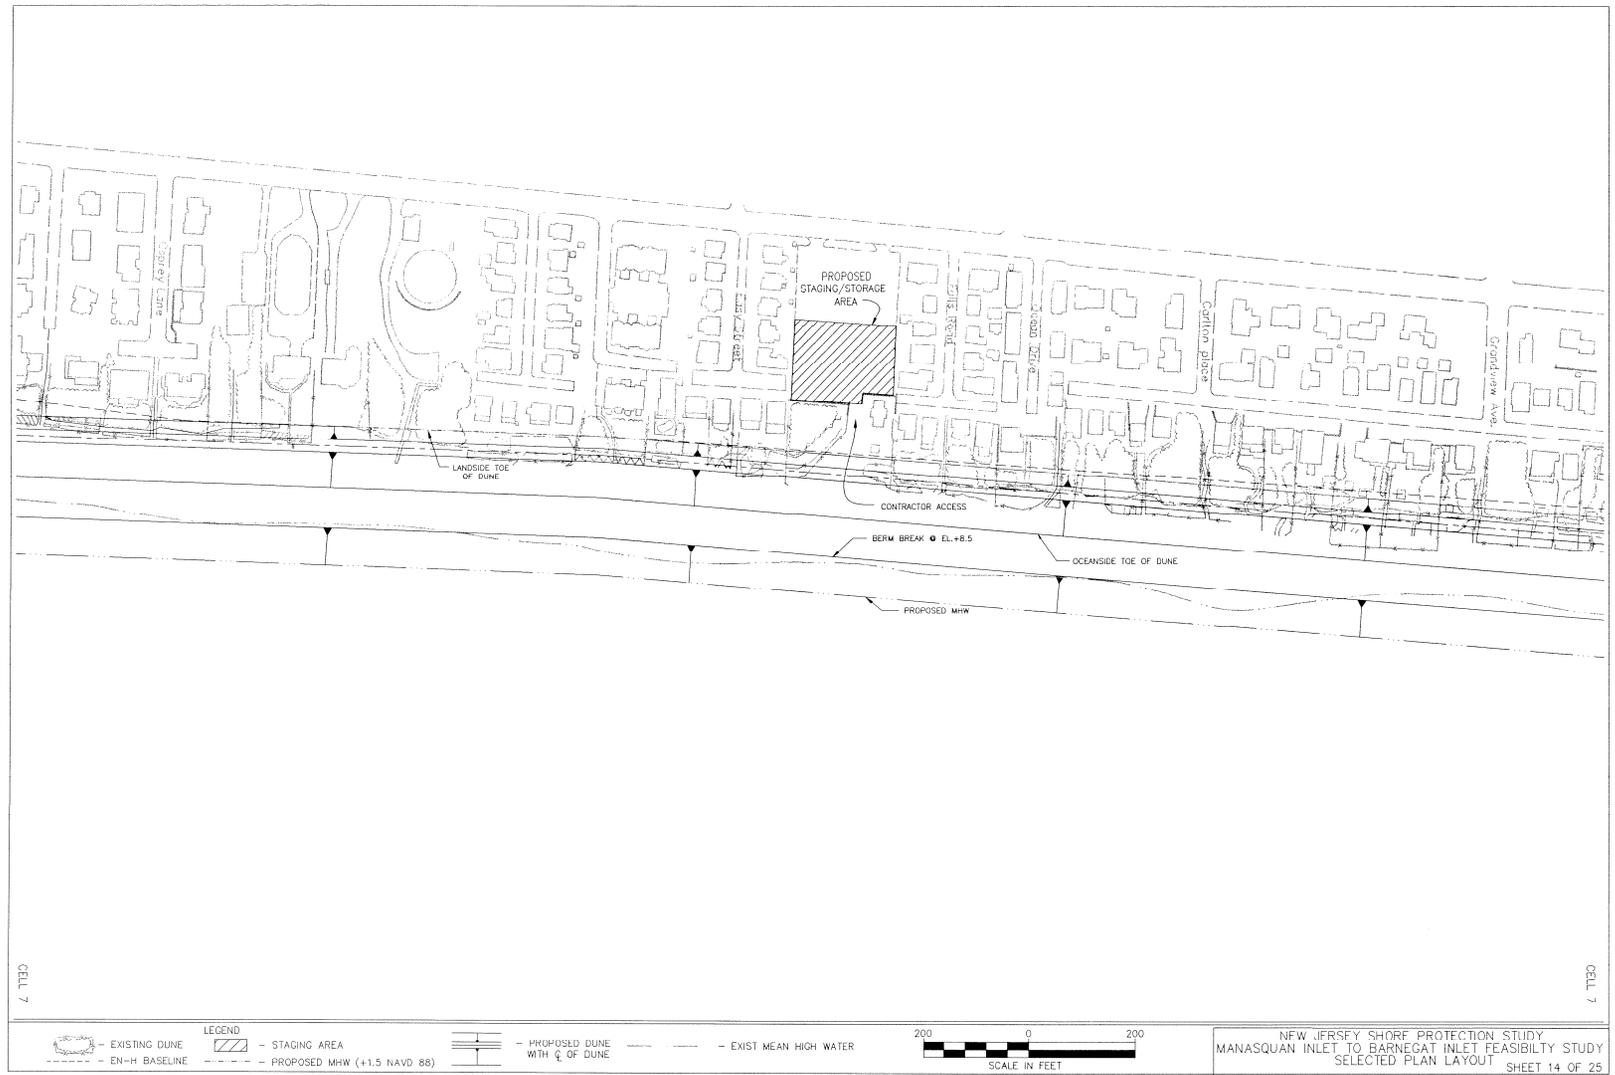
Selected Plan Layout – Brick Township, Mantoloking Estates to South Mantoloking Beach
